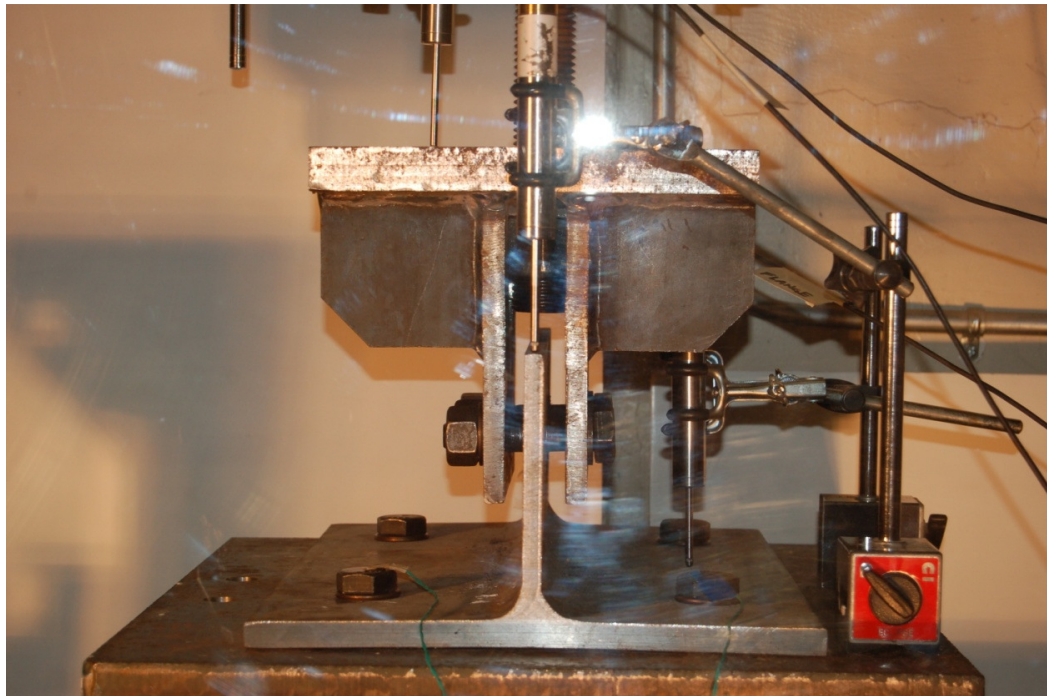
Deformed Shape for Specimen 3.0b at 100 kips Applied Load.
